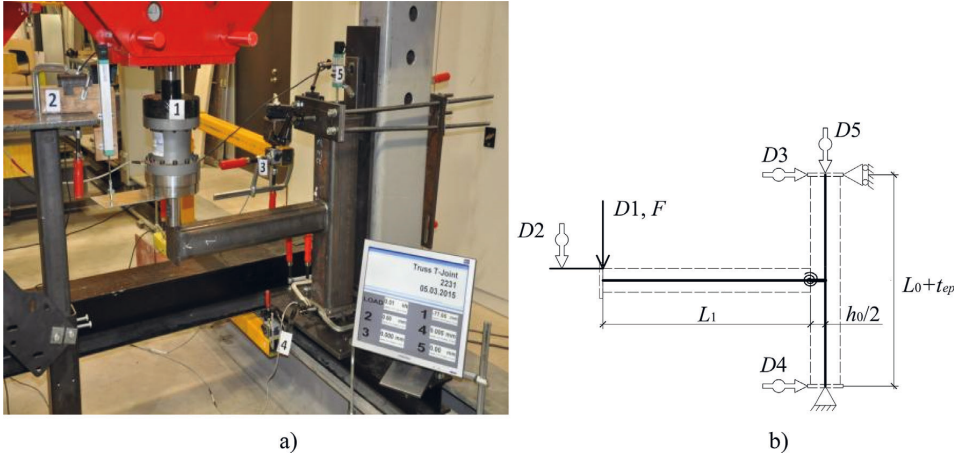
Test setup: (a) test arrangement overview, (b) static model of test specimen.
